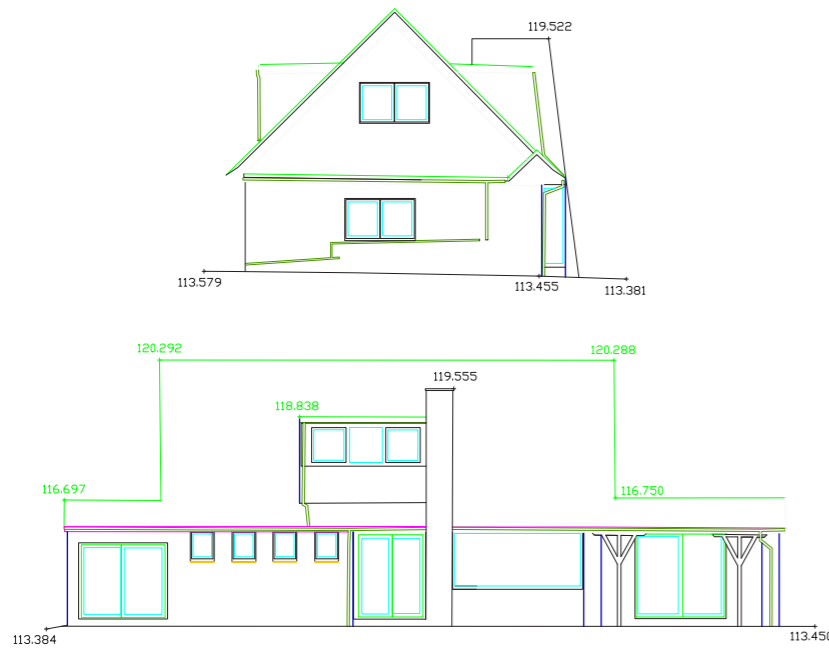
71 Leeson Road Existing South and West Elevations - Not to Scale
